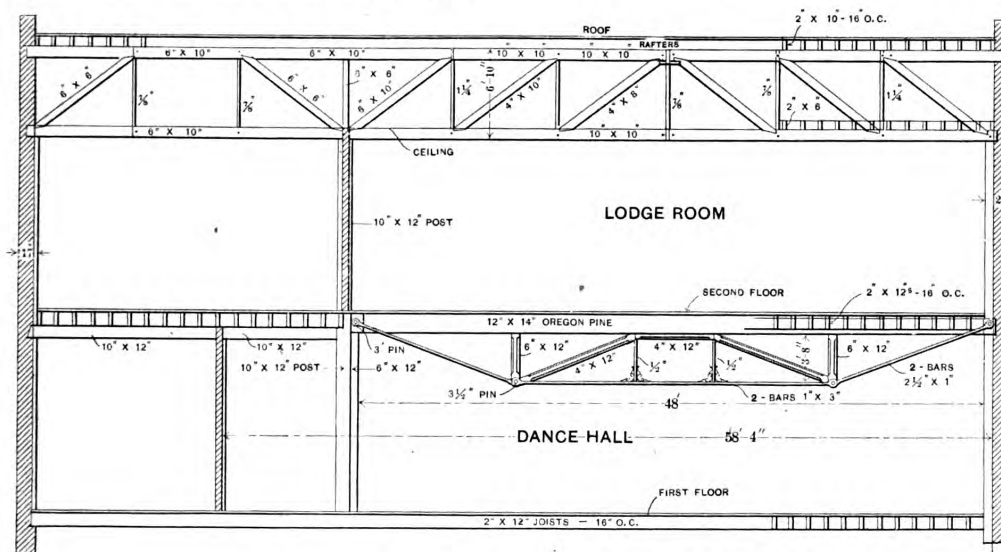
Longitudinal Section, Showing Trusses.—Scale, 1-12 Inch to the Foot.
